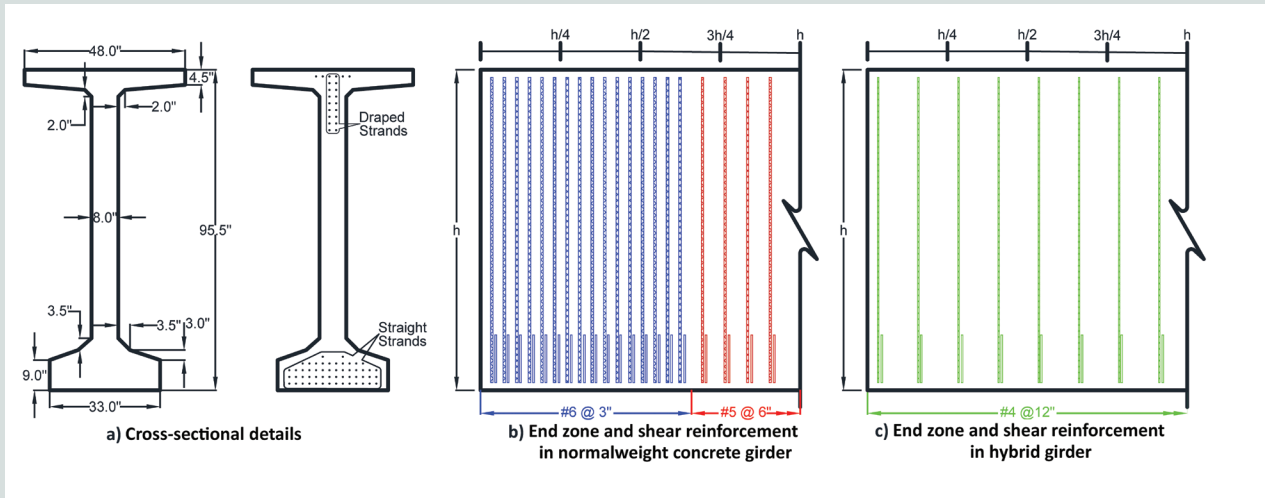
Cross section and reinforcement details of normalweight and hybrid PCEF girder. Note: h = girder height; PCEF = Precast Concrete Economical Fabrication Committee standard bulb-tee girder shape. #4 = no. 4 = 13M; #5 = no. 5 = 16M; #6 = no. 6 = 19M. 1" = 1 in. = 25.4 mm.
